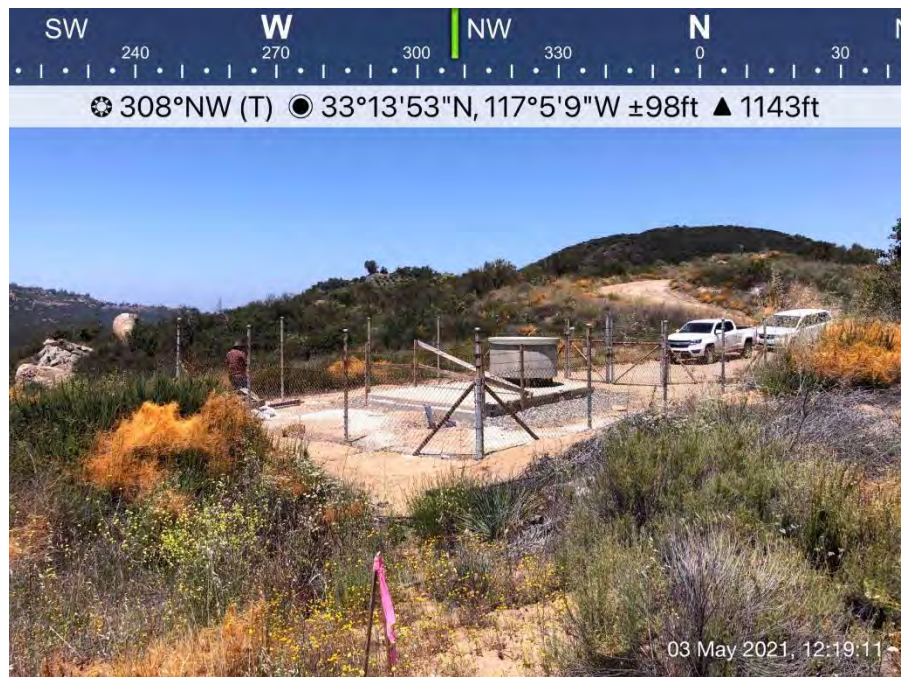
The southern portion of Study Area 5 is centered around the downstream Red Mountain Tunnel bifurcation structure. The structure is surrounded by coastal sage scrub and southern mixed chaparral.
